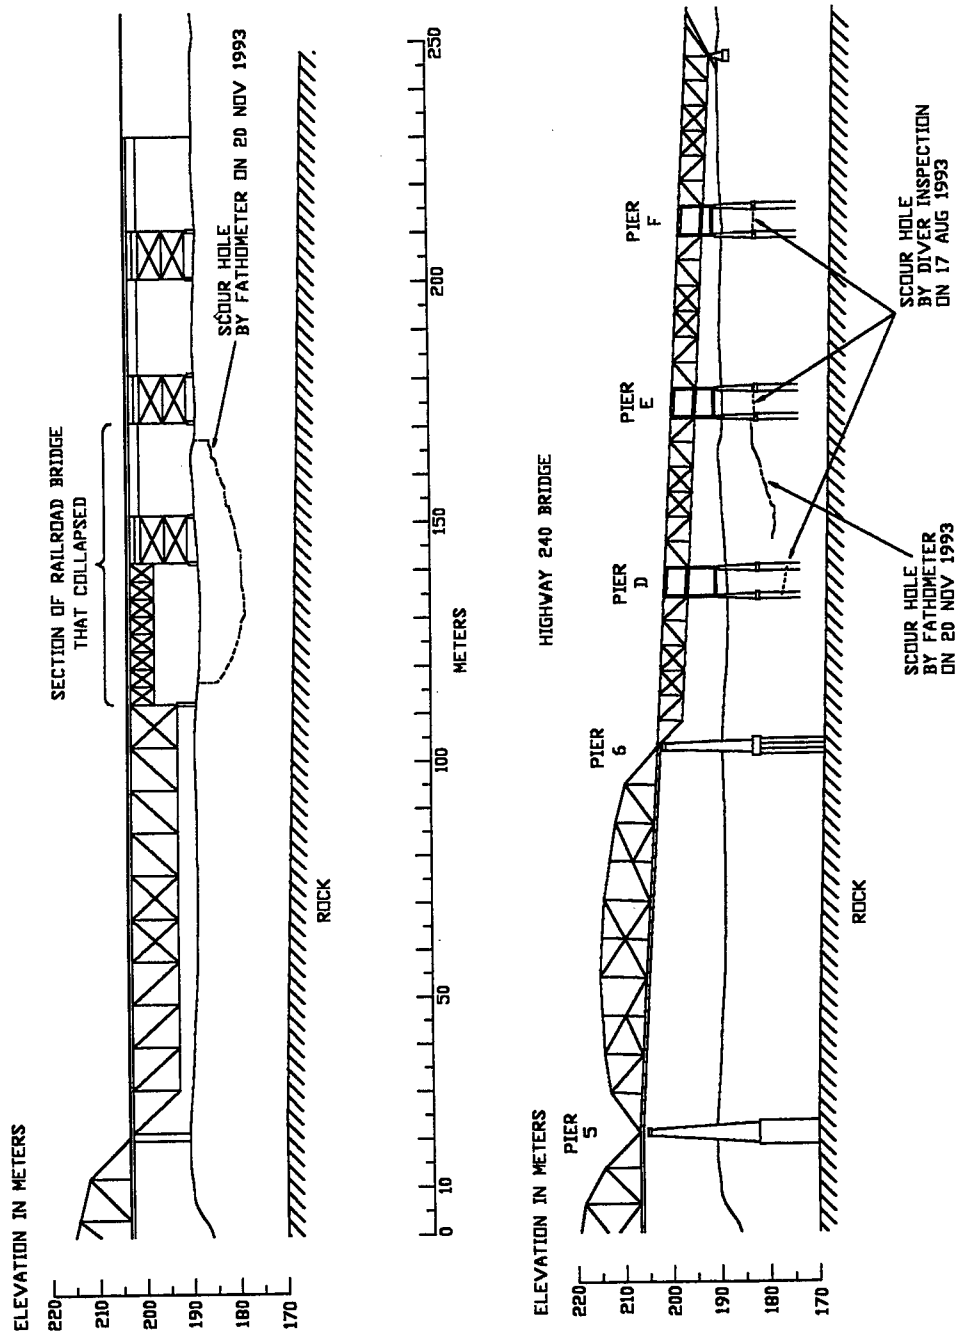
Downstream view of west floodplain section at railroad bridge and Missouri Highway 240 bridge, with sections of scour holes, near Glasgow, Missouri (bridge design courtesy of Missouri Highway and Transportation Department).
